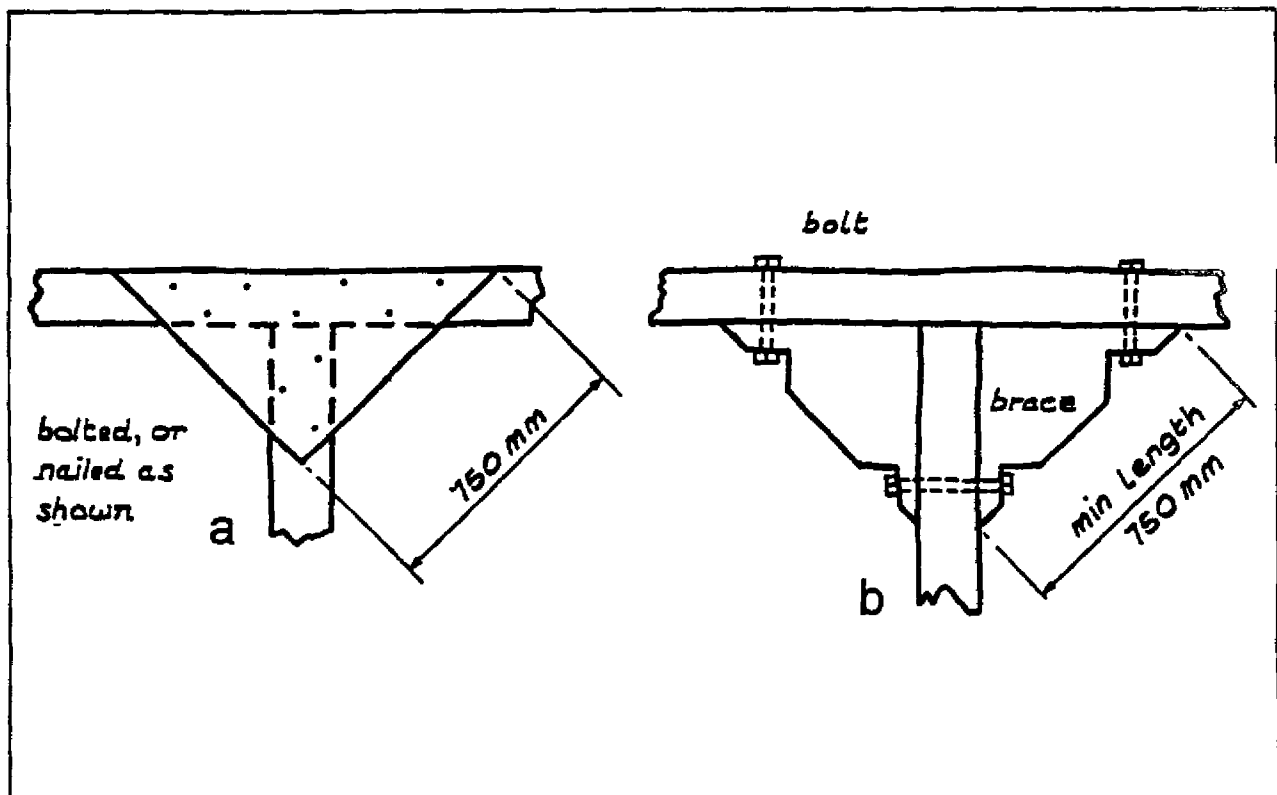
Stiffening of Corner by Nailing Triangular Sheet (a) and Bracing (b) [7].
